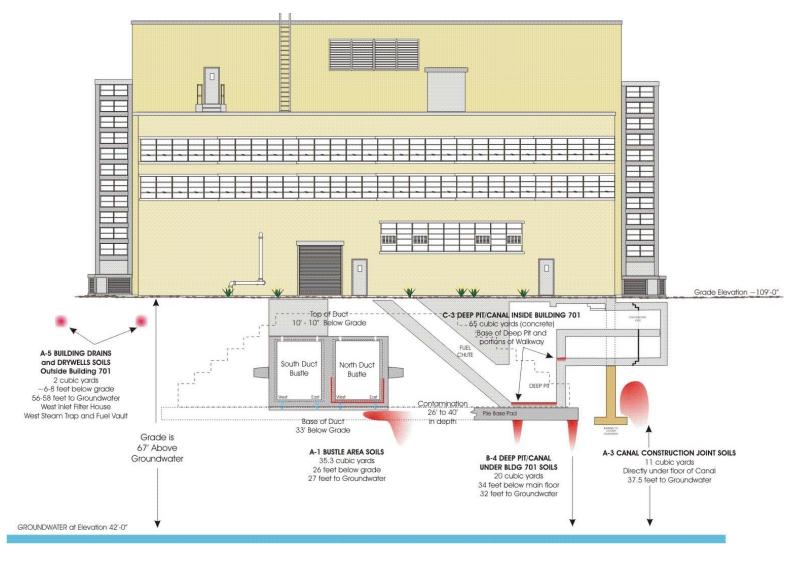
BGRR Contaminated Soil & Subsurface Structures, View to North
